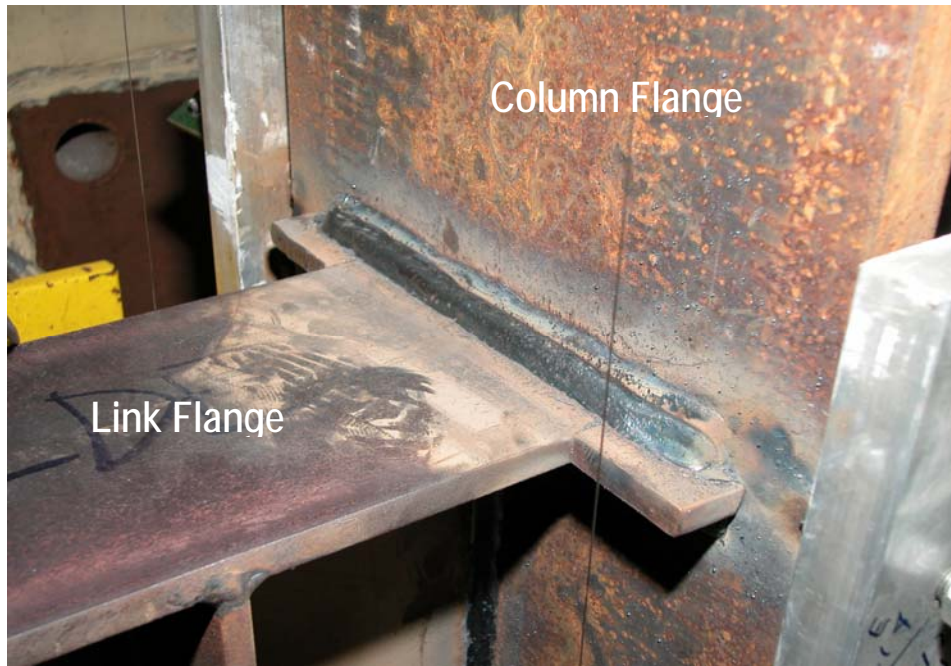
Fillet weld between link top flange and column flange in specimen AISC-2
